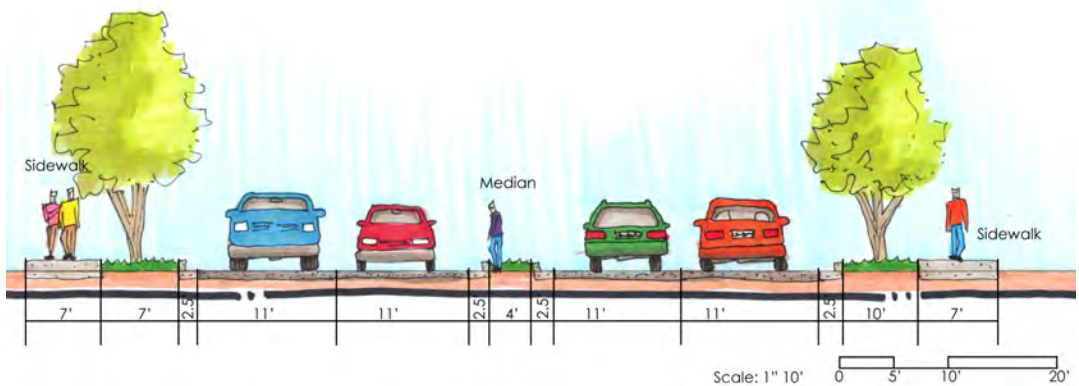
Possible cross-section for Atlanta Street between the Allenbrook and Barrington Roundabouts (Alternative 1)
